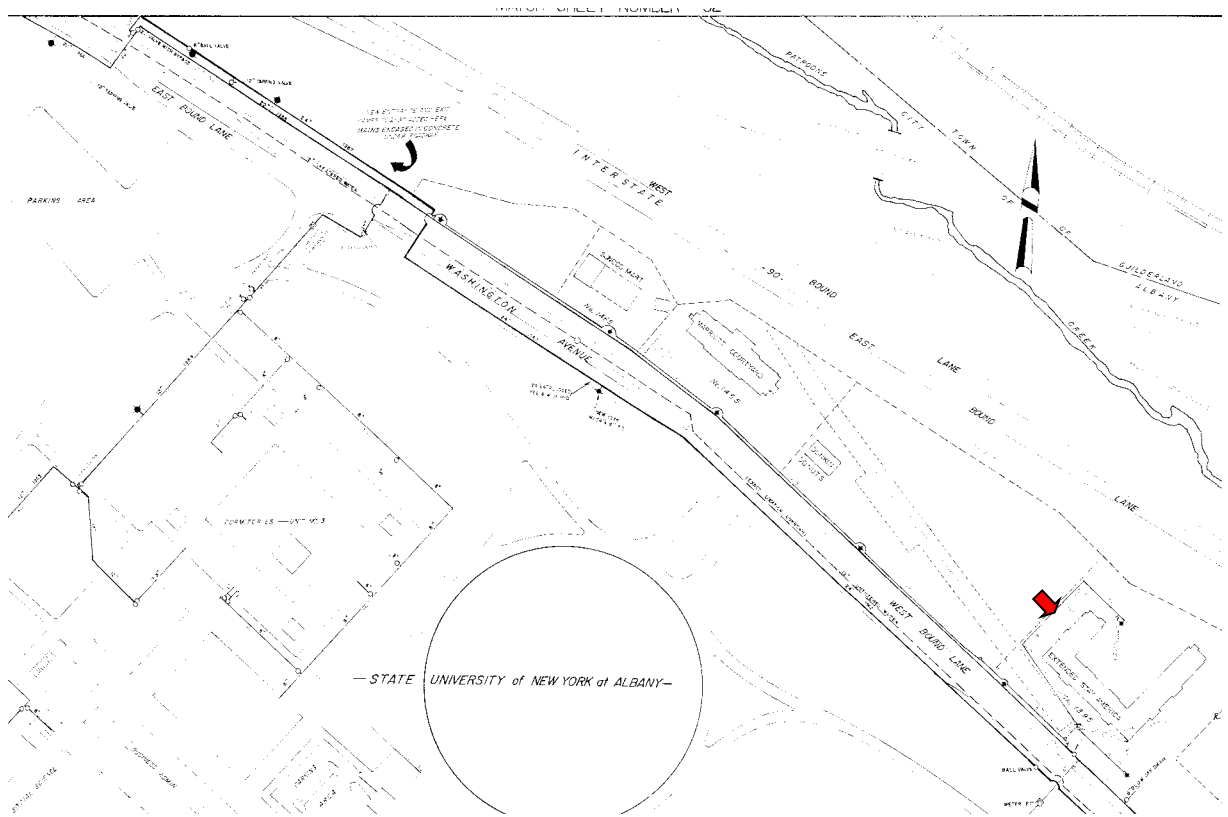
Portion of Water Atlas No. 34 with location of existing connection to No. 1415 Washington Avenue shown
